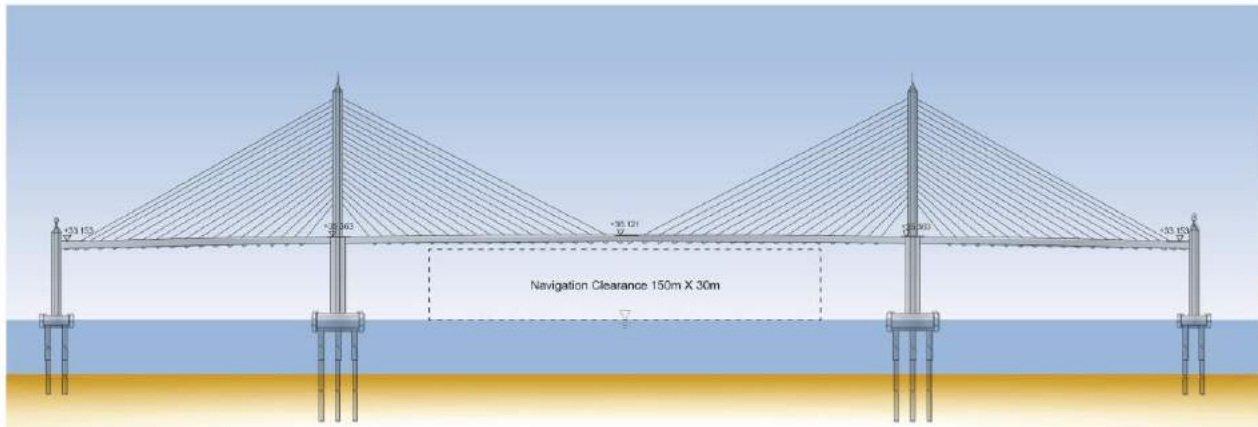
The Second Penang Bridge – cable-stayed bridge over the main navigation channel
